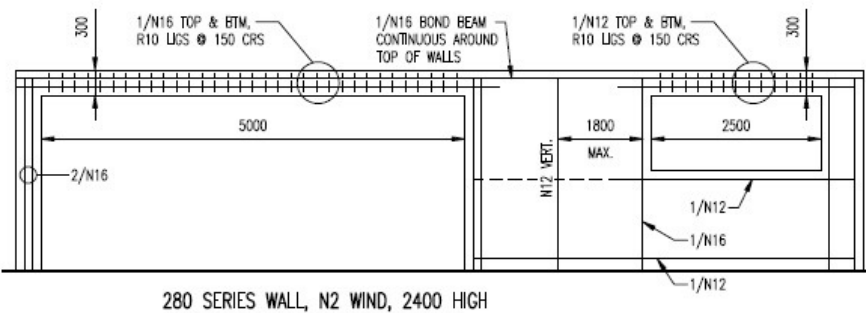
2400 High Wall, N2 Wind Rating, 280 Series ECO-Block (Max. roof load width: 5.6m)
